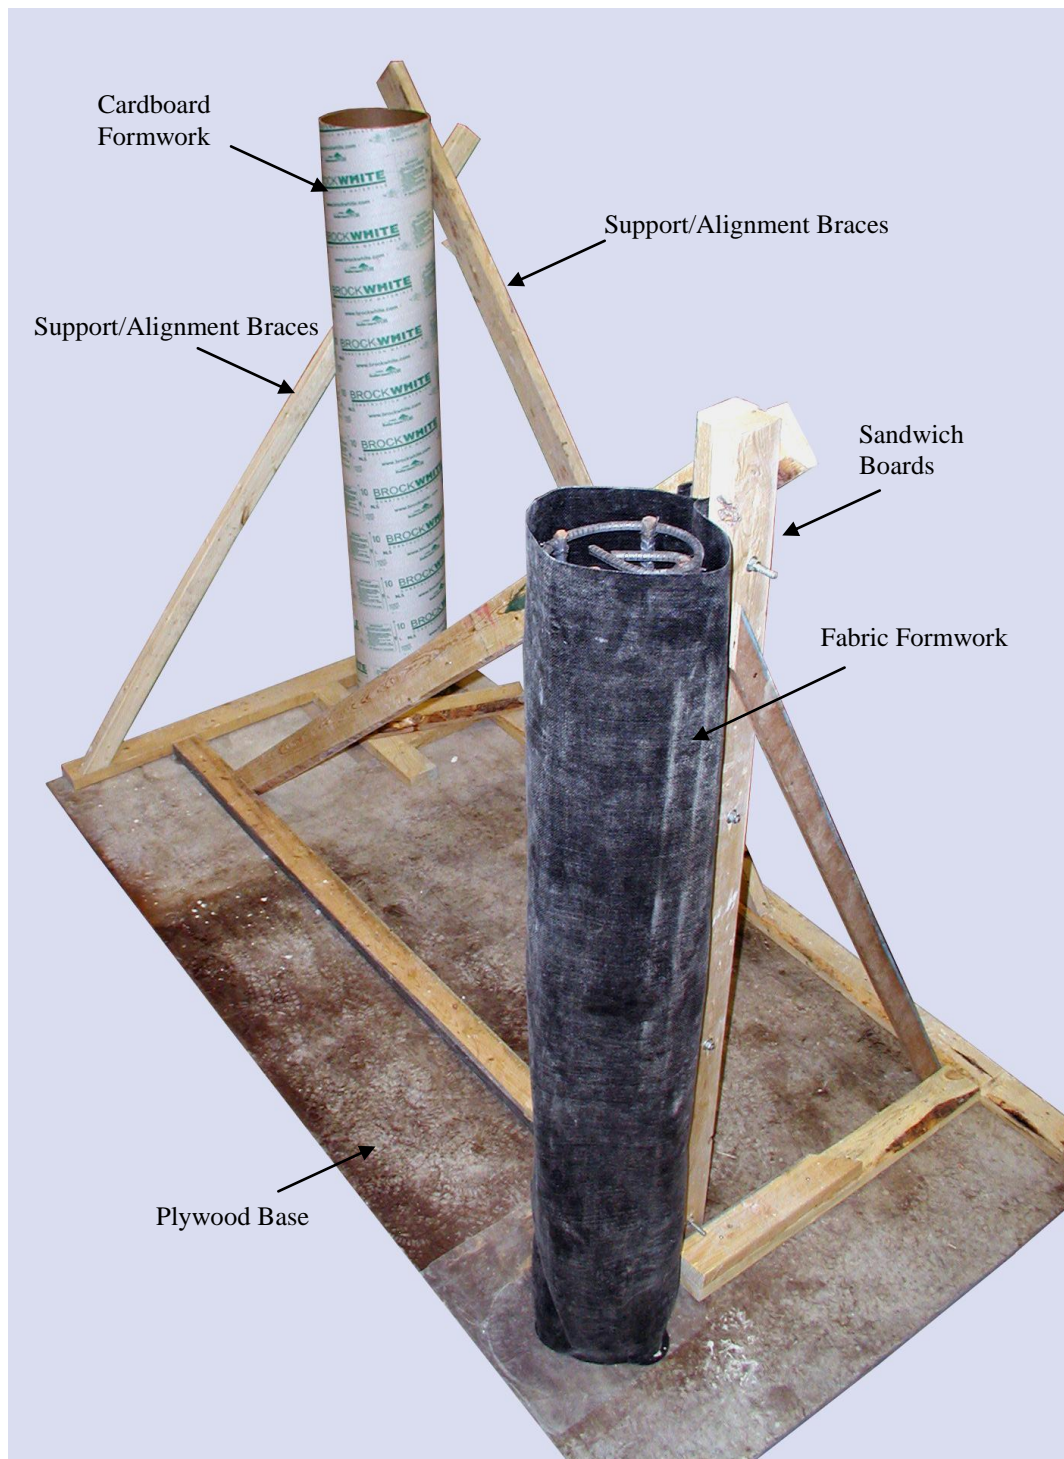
Setup for reinforced concrete columns formed with fabric and cardboard
